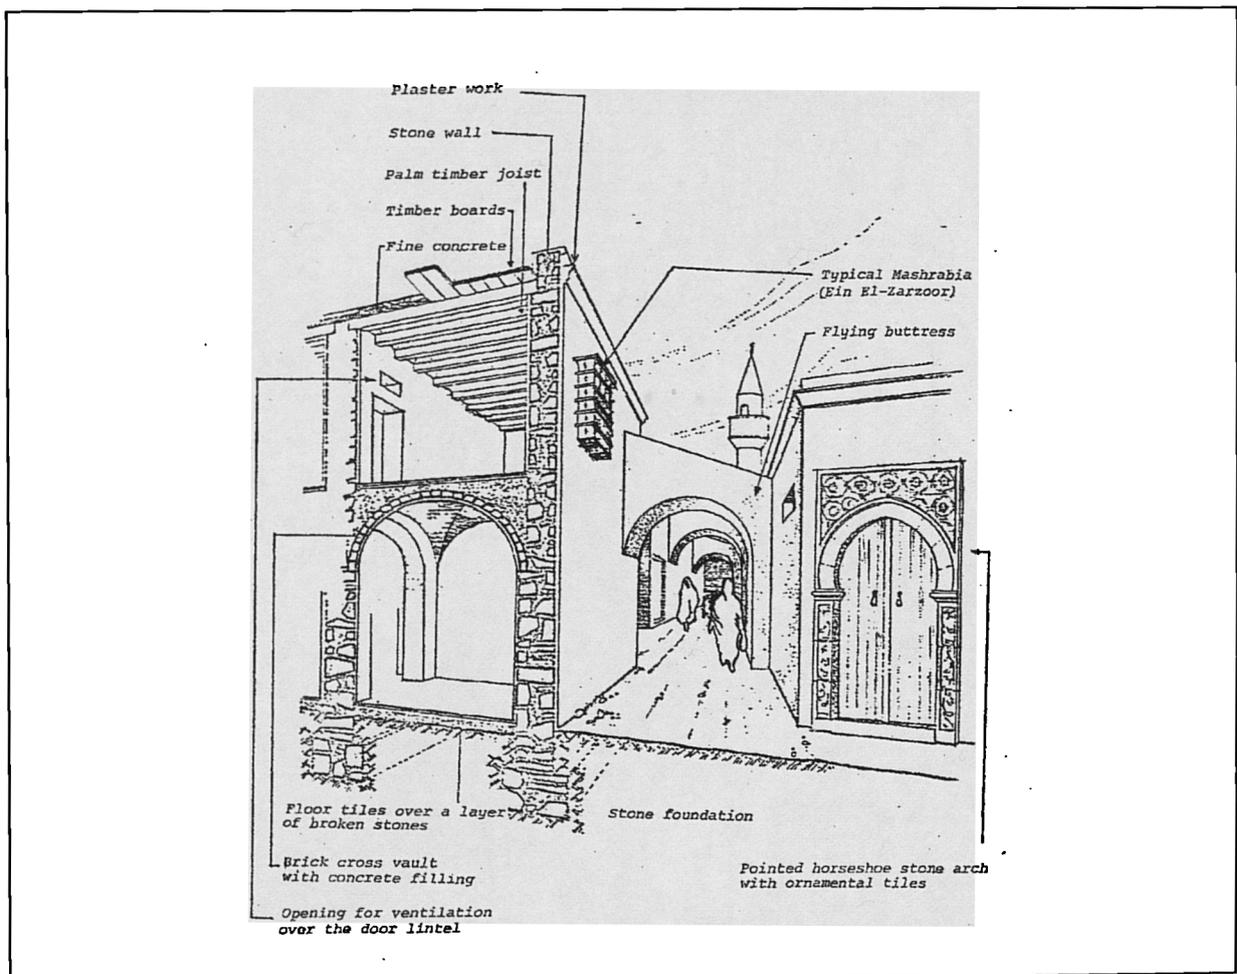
A cross-section of a typical alley in the traditional city shows the construction of the walls and its relation to the arches
